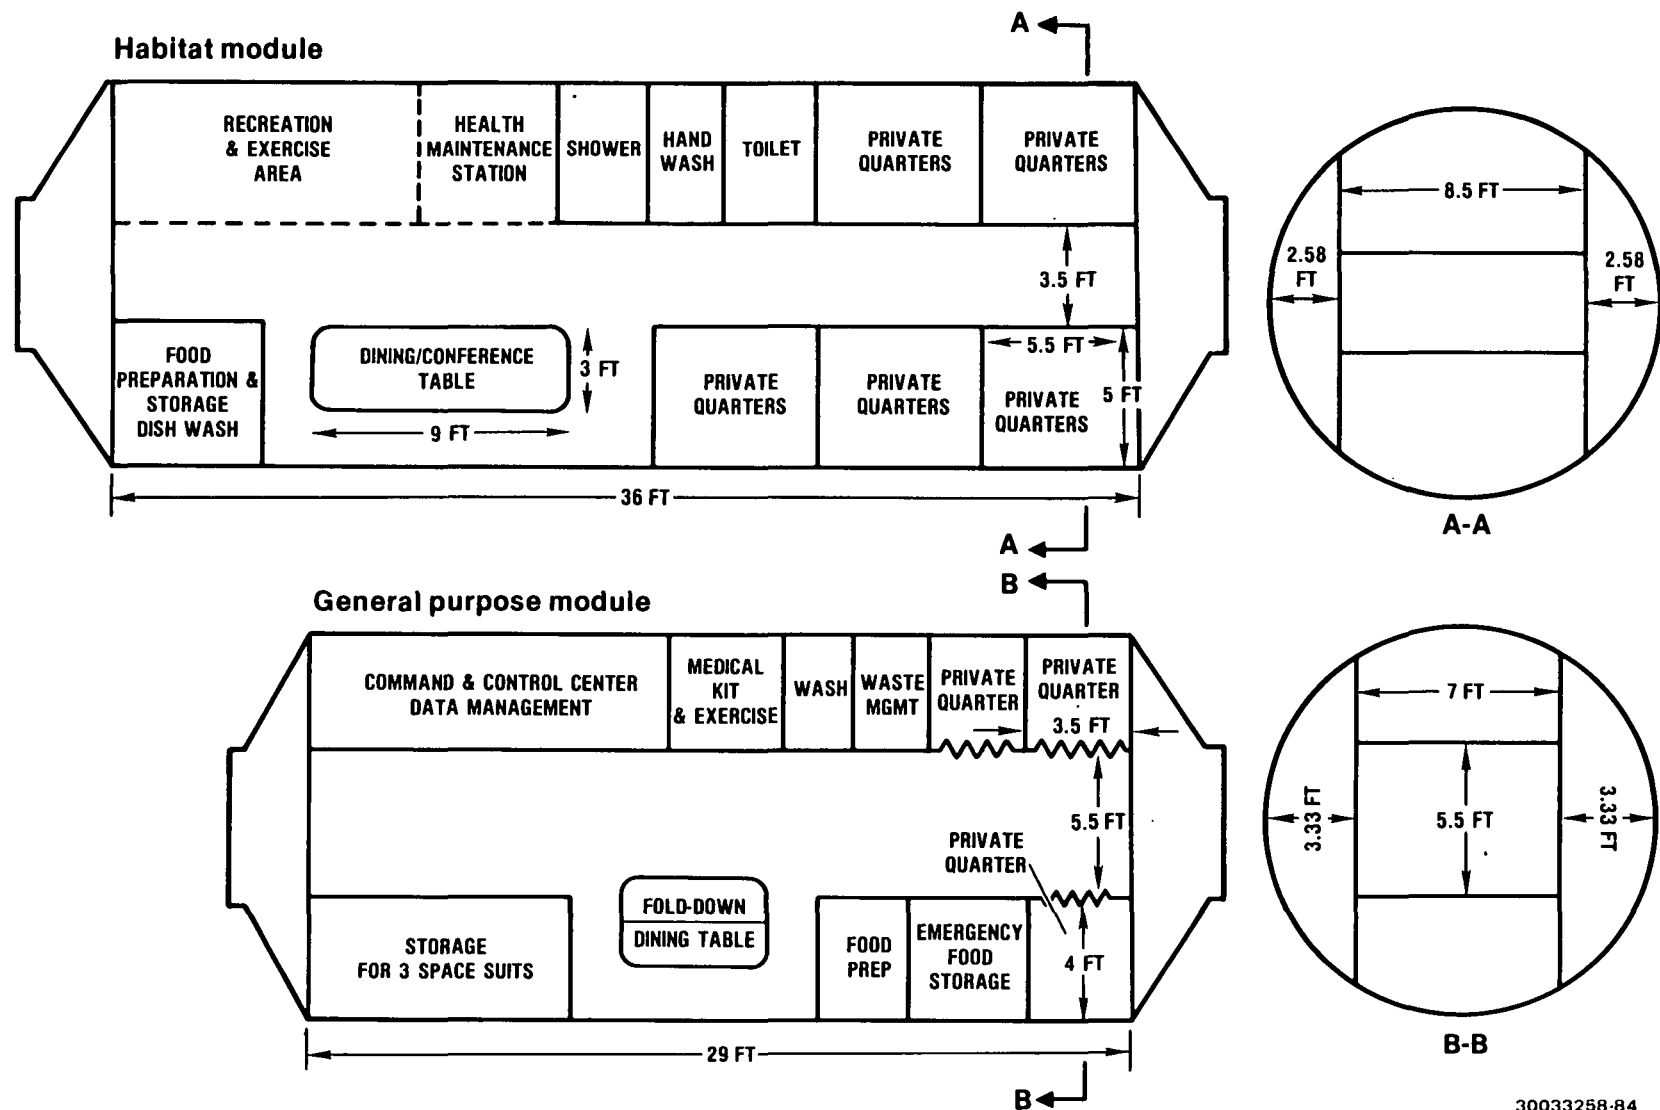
Floor Plan Concept for Habitat & General Purpose Module
